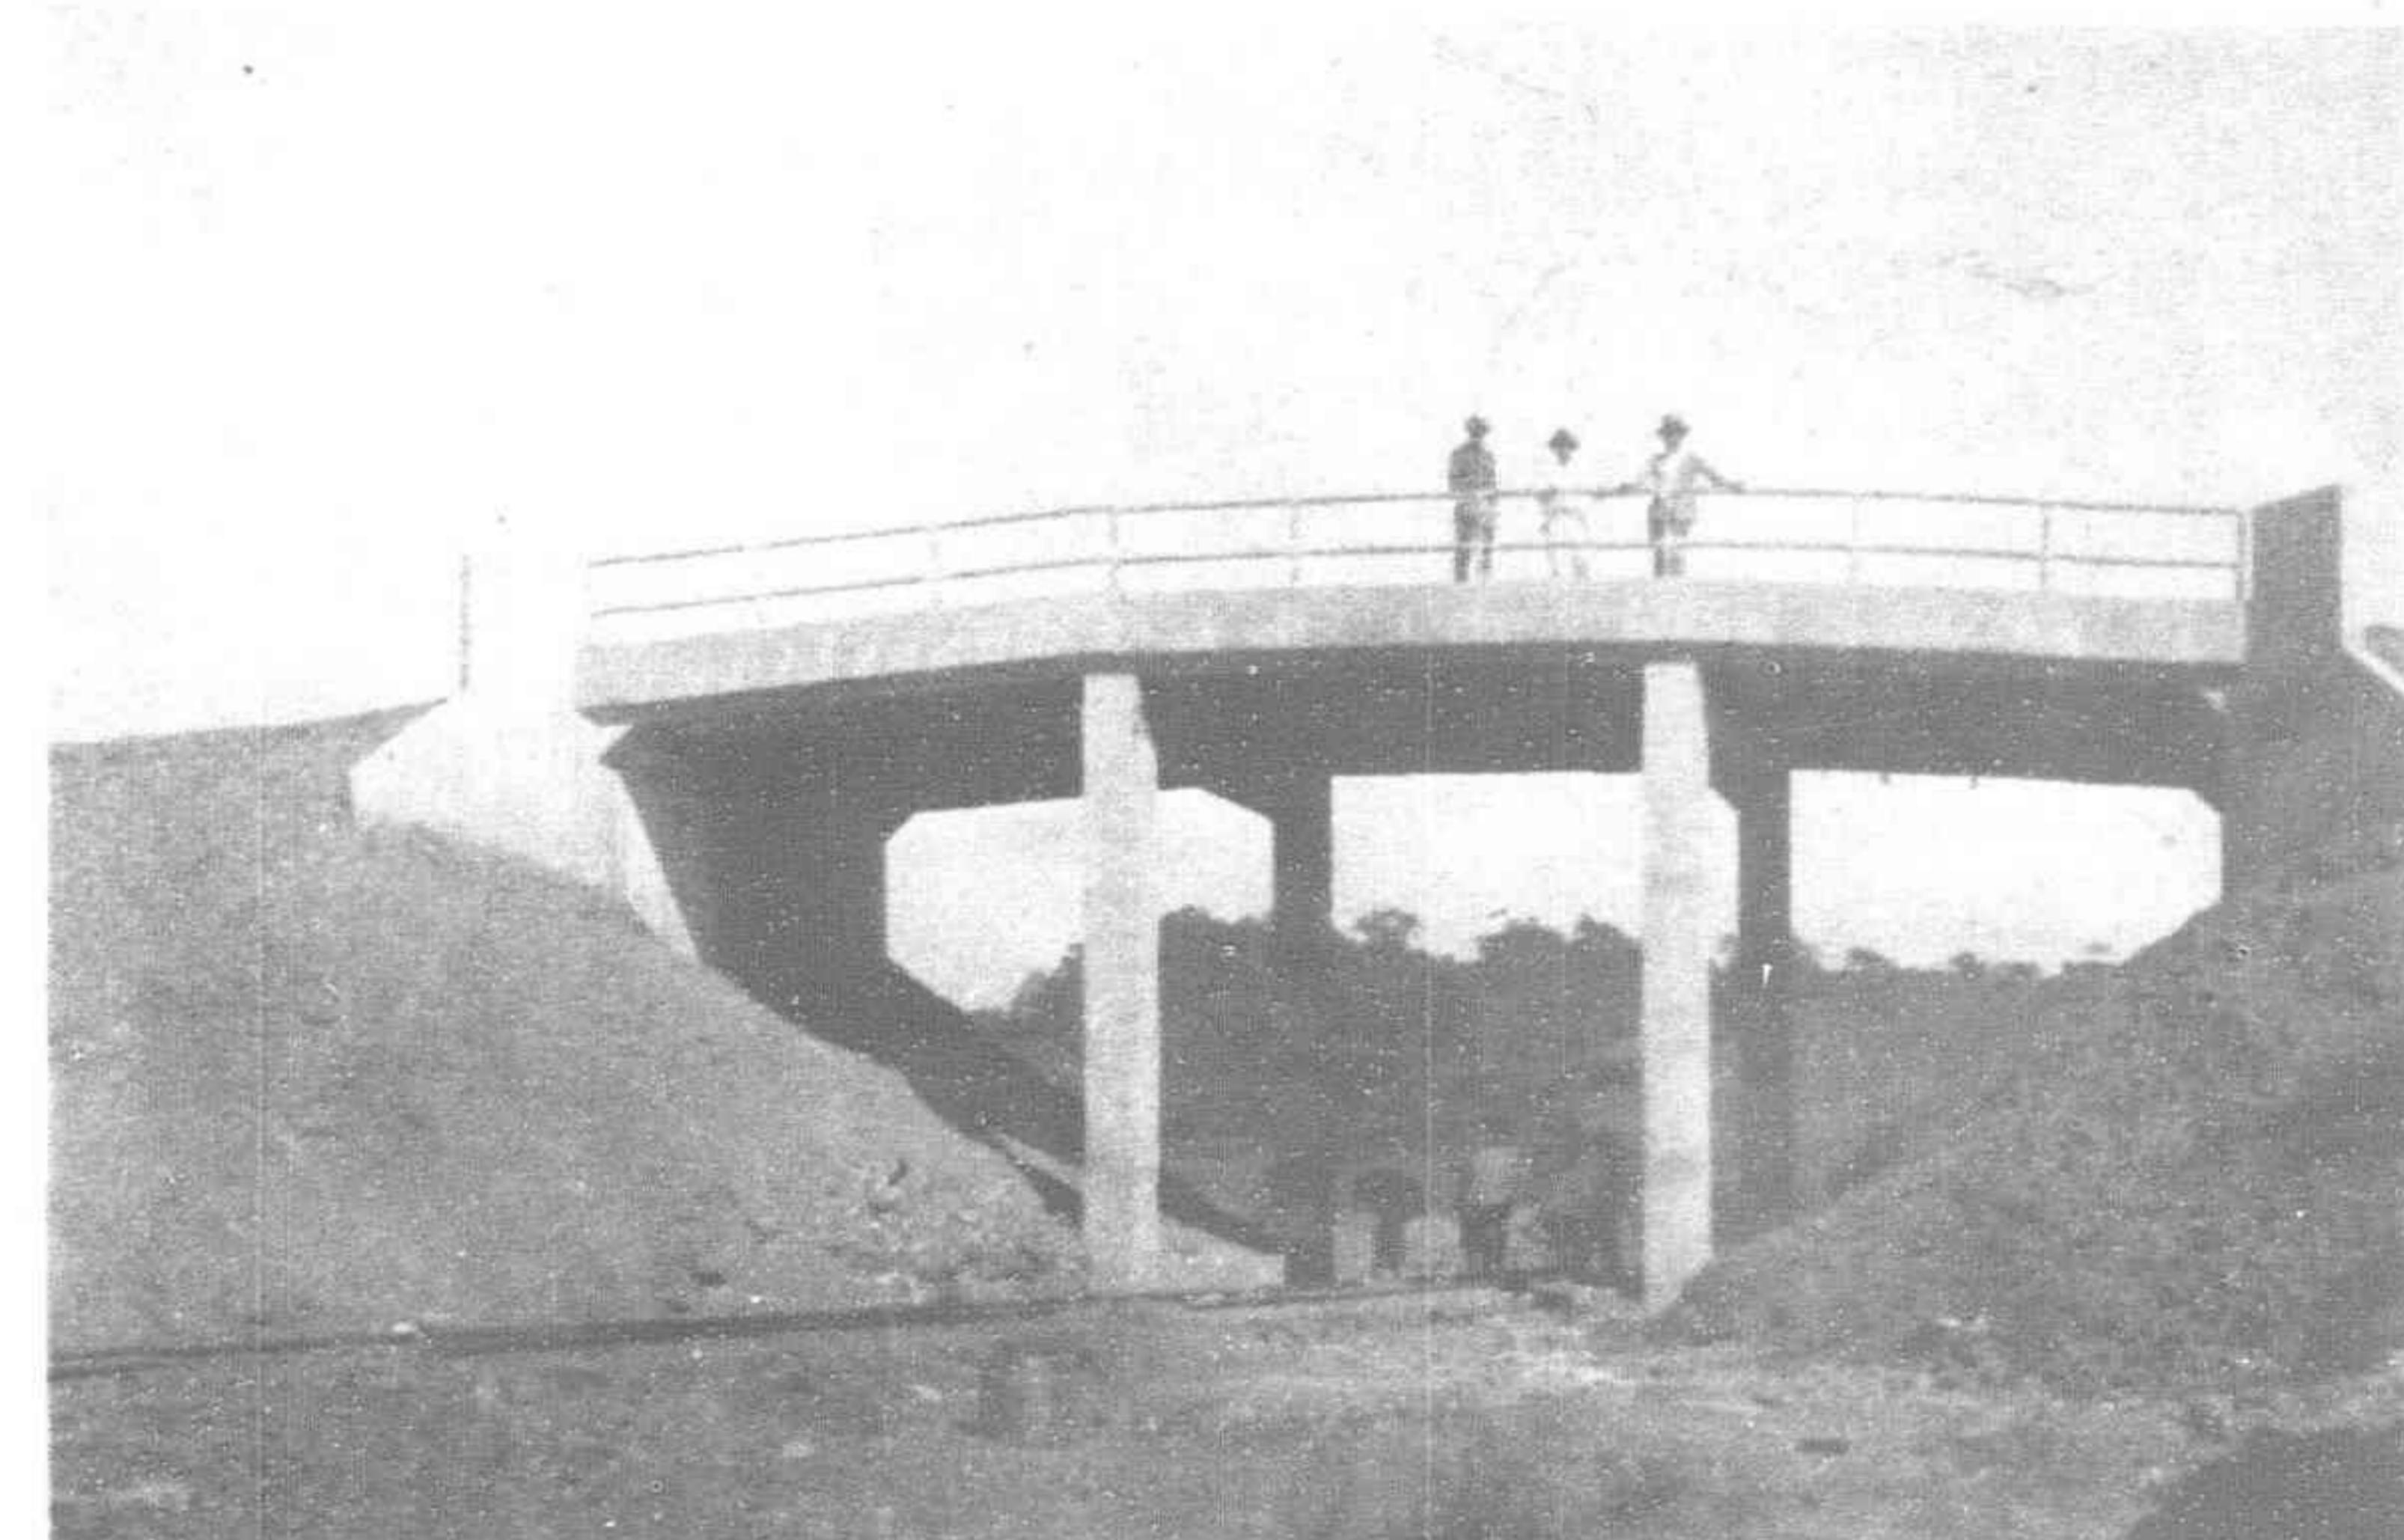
Highway Bridge built by Railroad 3-15-ft. Continuous Slabs
